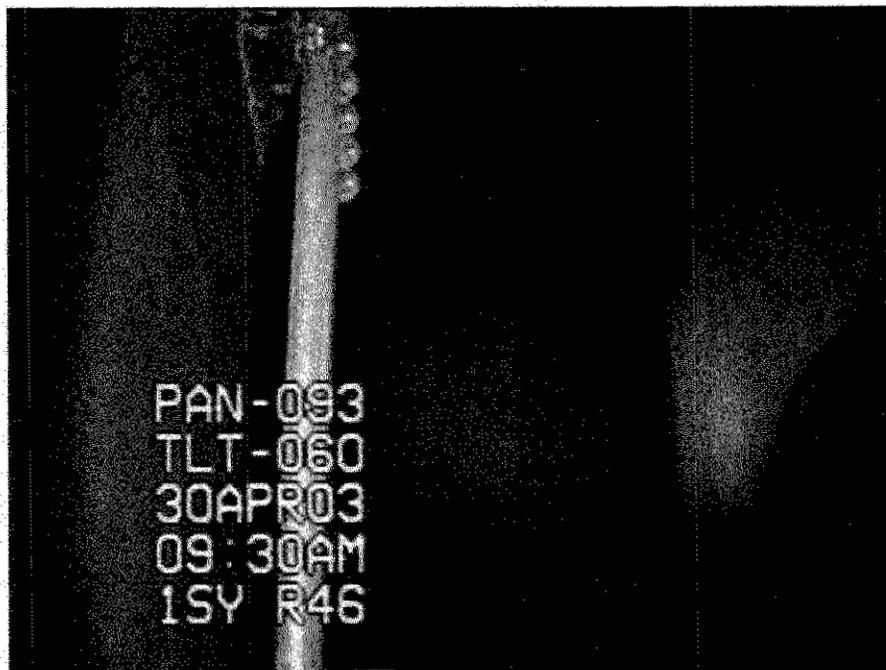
SY-101 Riser 46, Secondary Tank Wall (Left, 2003)
